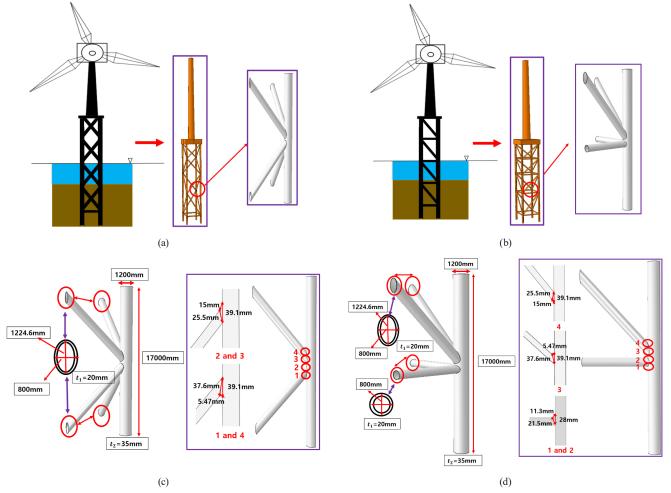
Model geometry and welding size; (a) Jacket structure with K-Type shape, (b) Jacket structure with N-Type shape, (c) K-Type model size and welding joint size, (d) N-Type model size and welding joint size.
